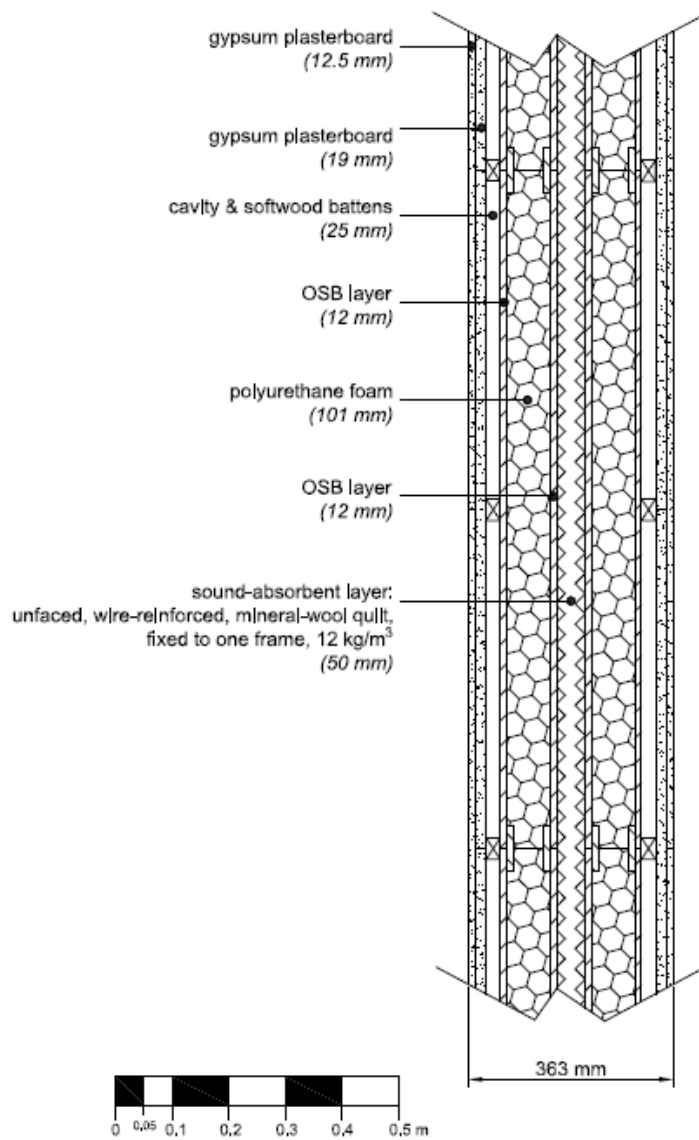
Party wall C (structural insulated panels (SIPs)), horizontal section.
